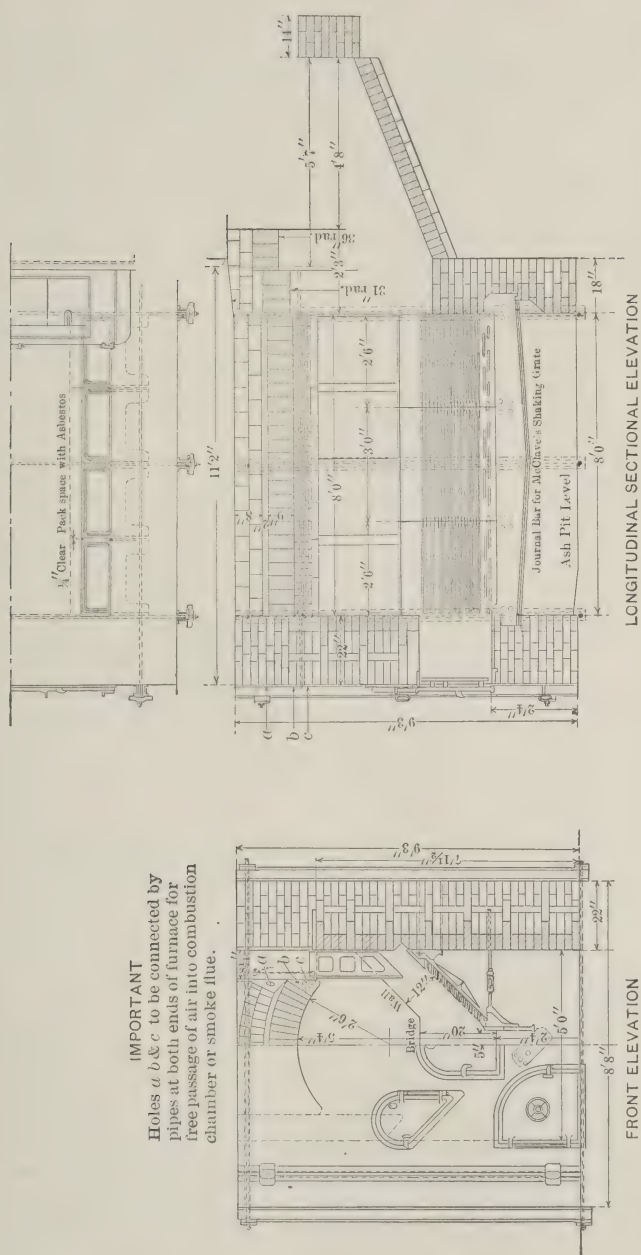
A MYERS FURNACE WITH ADJUSTABLE GRAVITY FEED. ADAPTED FOR BURNING TAN BARK OR SAWDUST
